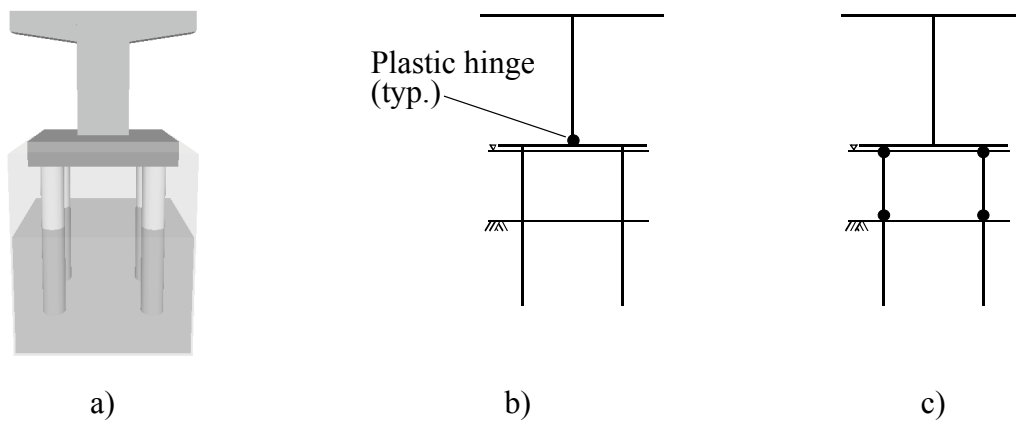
Collapse mechanisms considered in the probabilistic simulations conducted for the GND-CHA case. a) Structural configuration; b) Pier column collapse mechanism; c) Drilled shaft collapse mechanism
